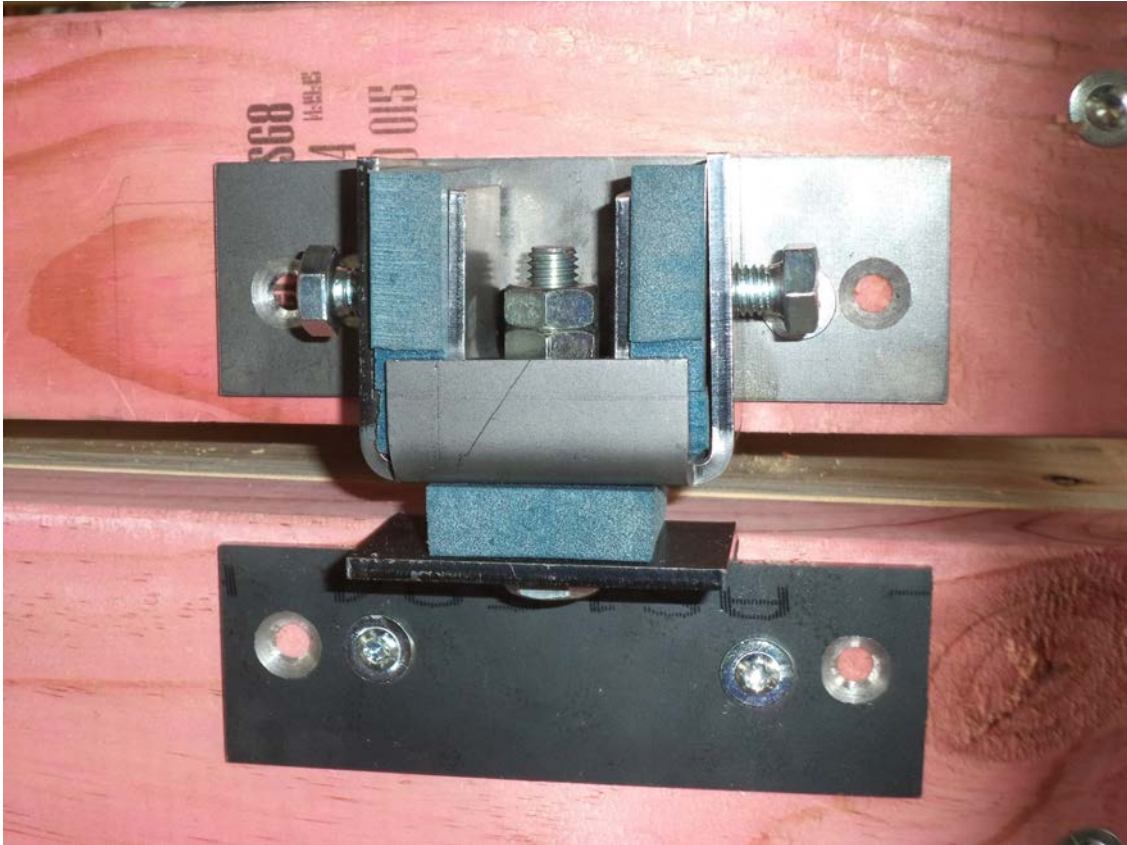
Across-plate connector design prototype as screwed on to bottom plates. Screw holes were redrilled to fit a slightly different screw head from that initially anticipated.
